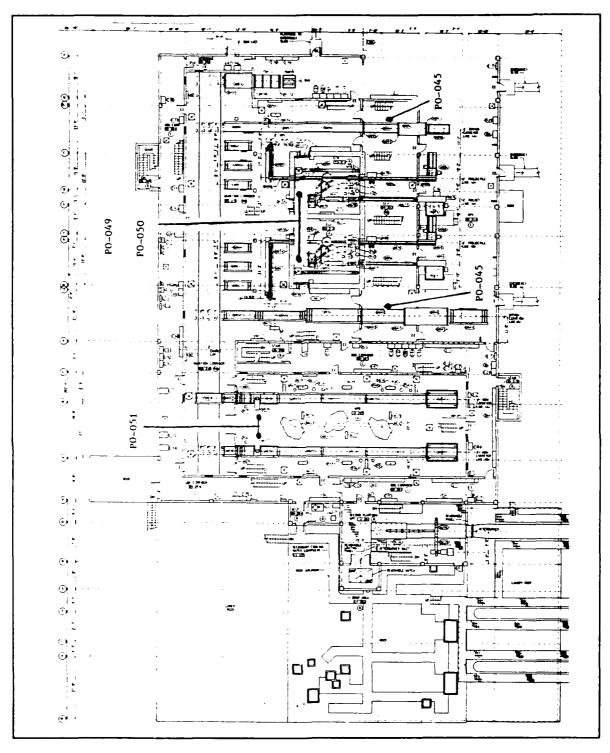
TEAD MDB Second Floor Plan (Scenarios PO-045, PO-49, PO-050 and PO-051)
